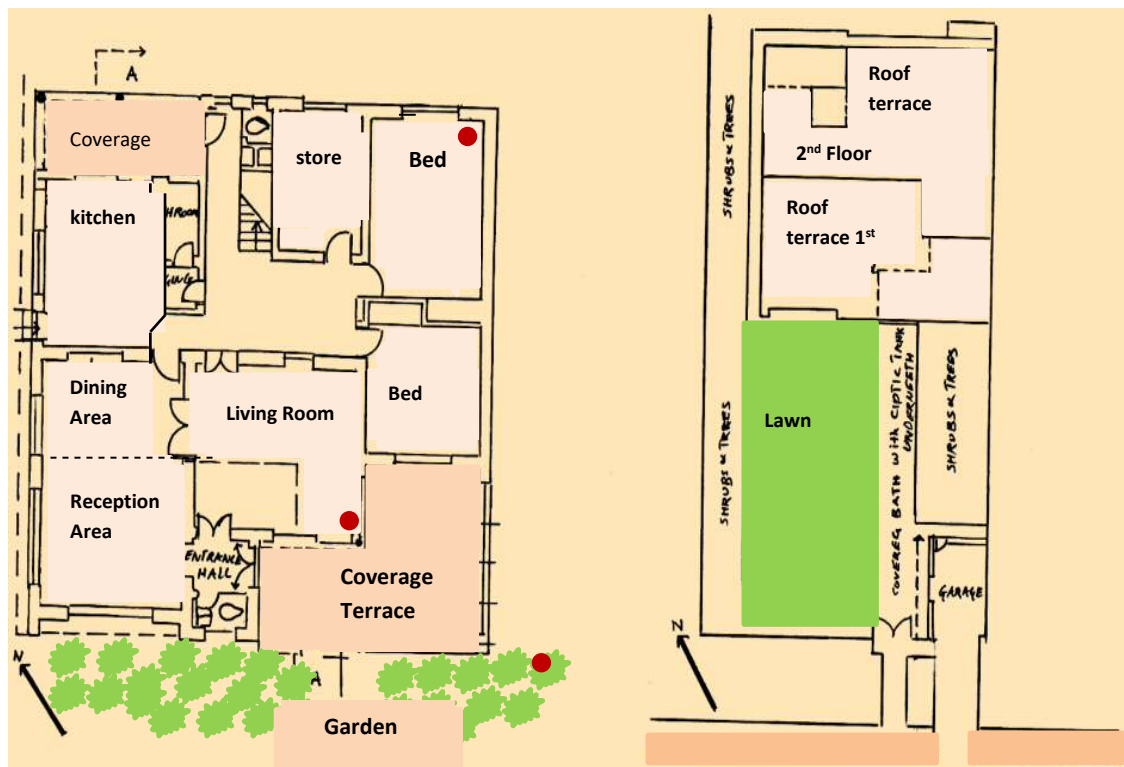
Site plan and ground floor level plan (Researcher) Scale: 1:100
